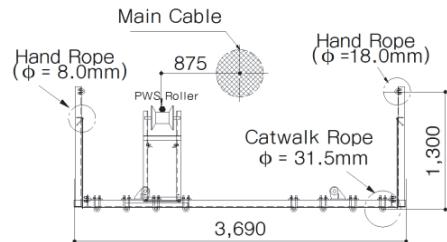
Detailed section of the catwalk system (Unit: mm)
